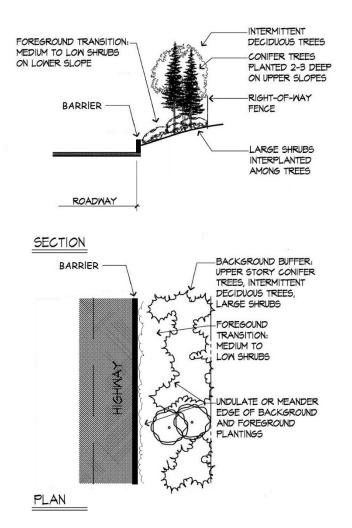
Roadside Planting on Cut Slopes with Barrier or Guardrail.
